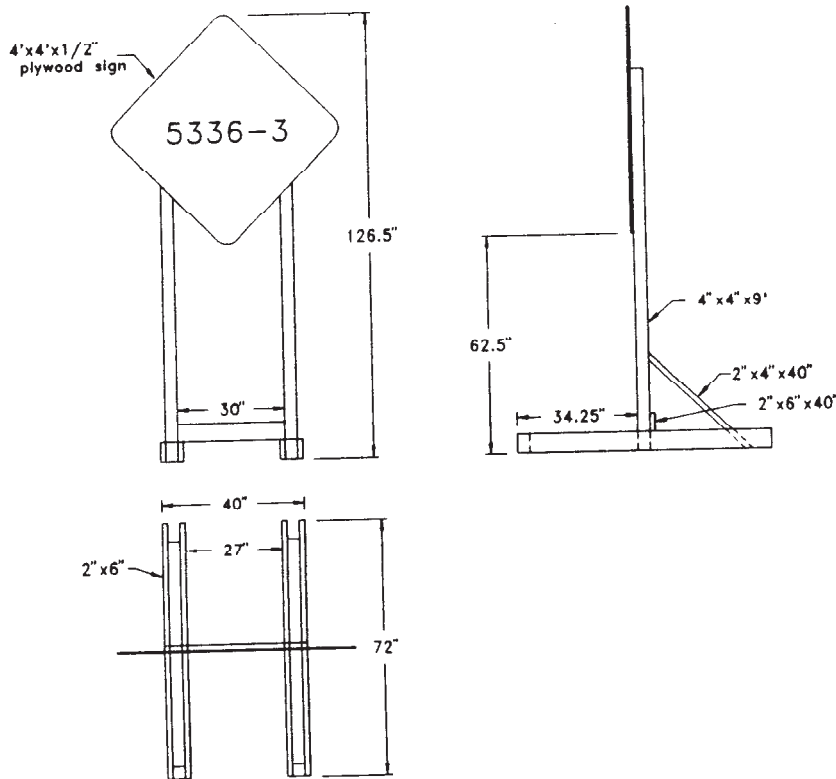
Schematic of Skid-Mounted Sign Support with Wooden Sign Panel (Test No. 453360-3)
